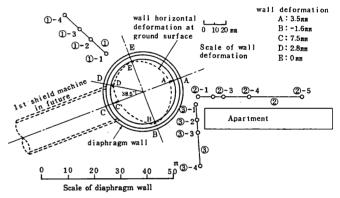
Wall horizontal deformation at the ground surface after the 6th excavation.
